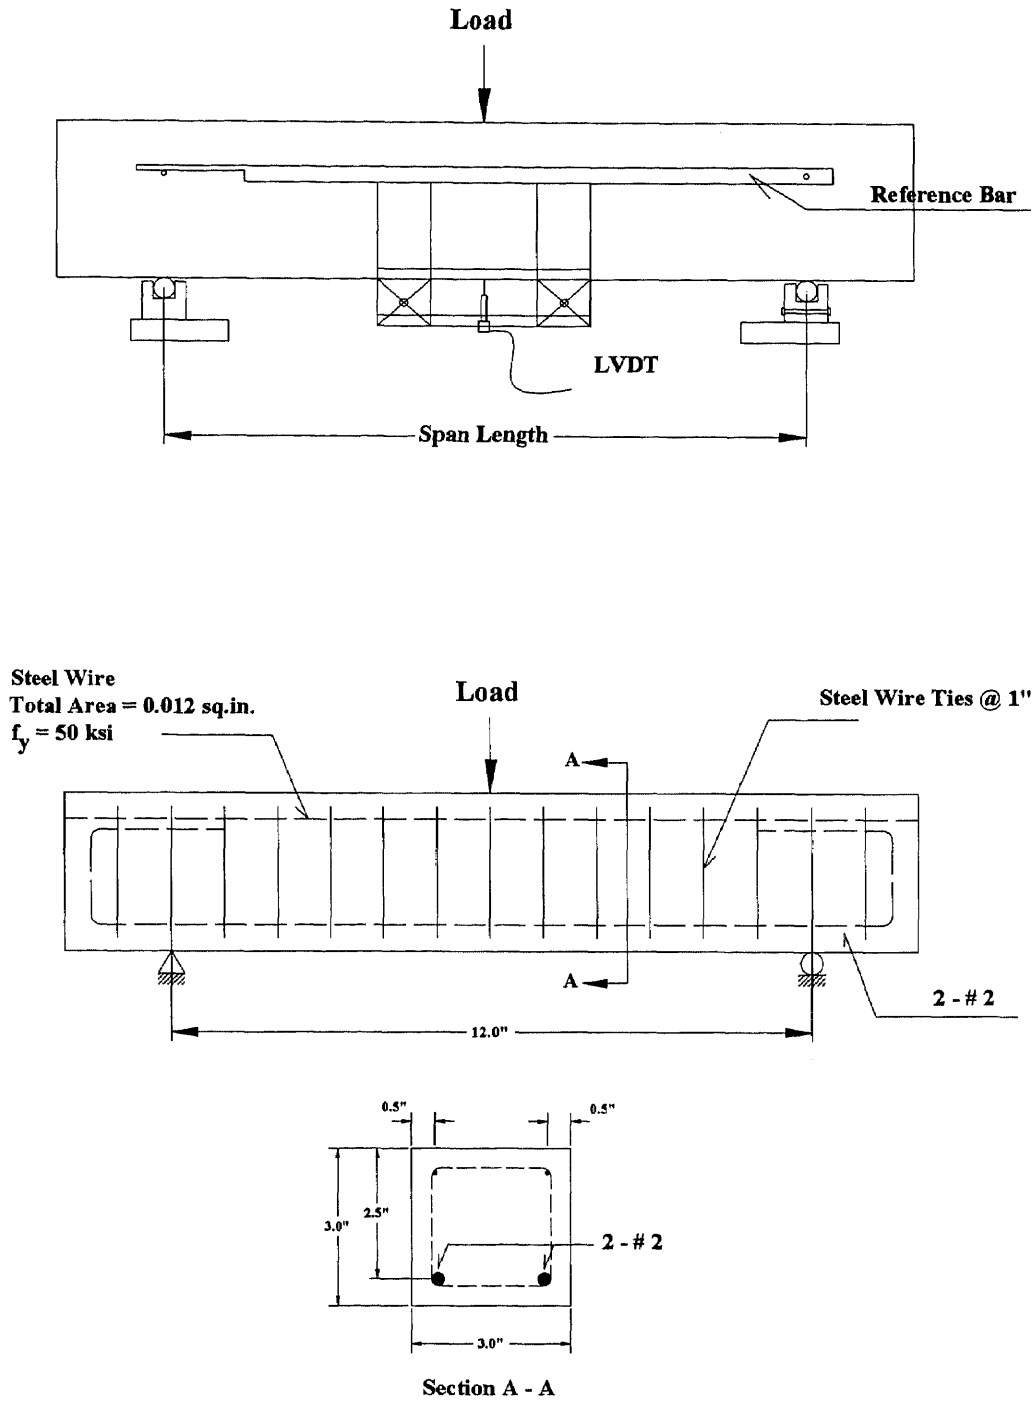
Loading Arrangement and Cross Section of Beam Specimens
